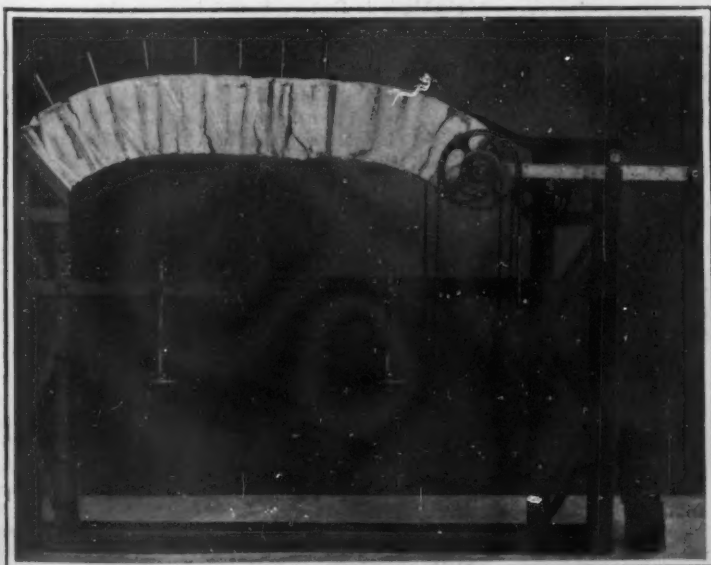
Arch under load, showing breaks at crown and abutments.
